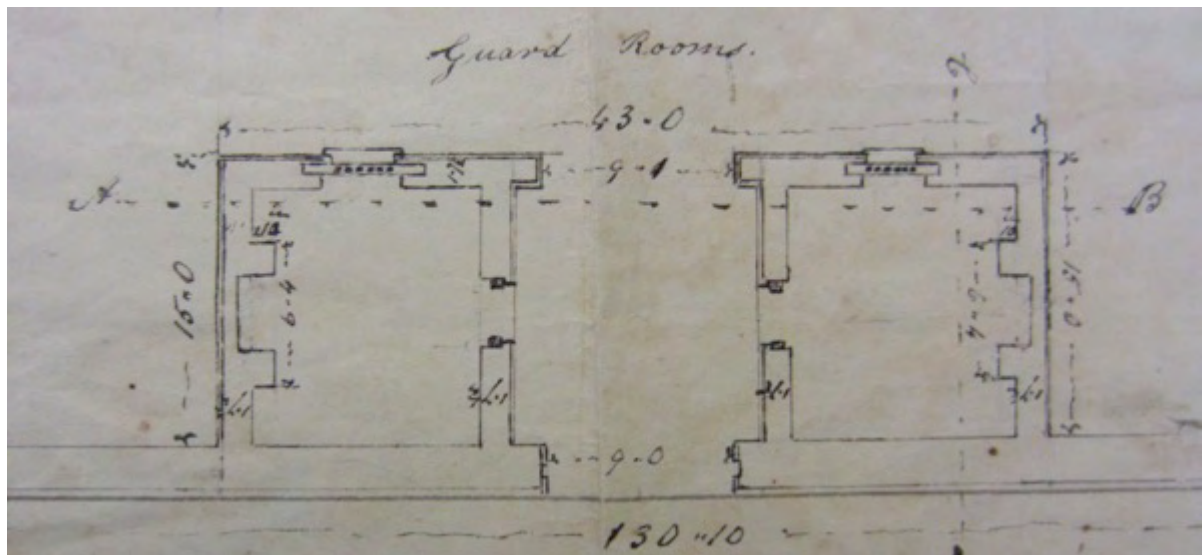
Guardrooms detail. Plan of layout mid 1845.
